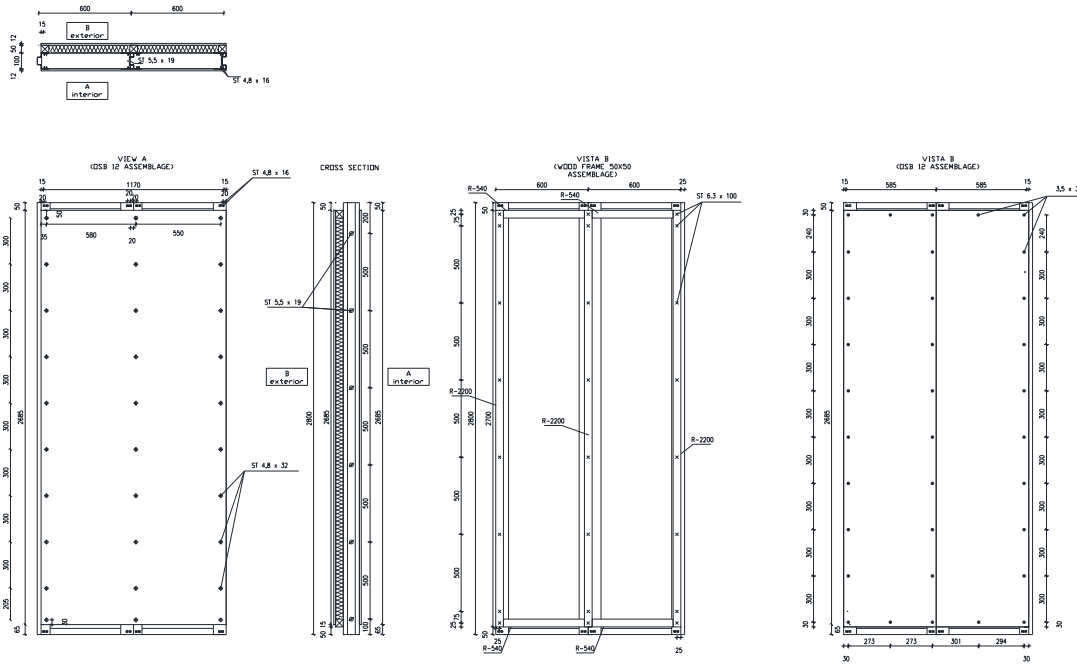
Frame braced by OSB with steel frame connection spacing – 300 mm.
